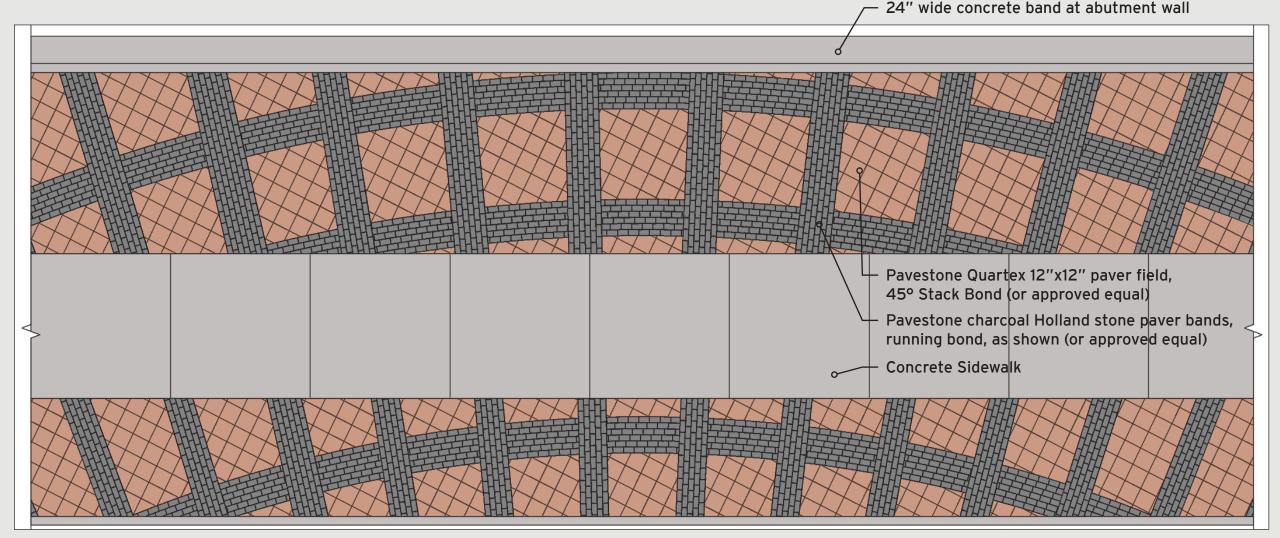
Paving Pattern and Sidewalk at Abutments
